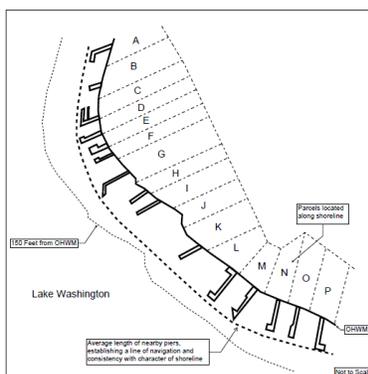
A - How to determine the allowable length of a single-family pier (83.270.4).
